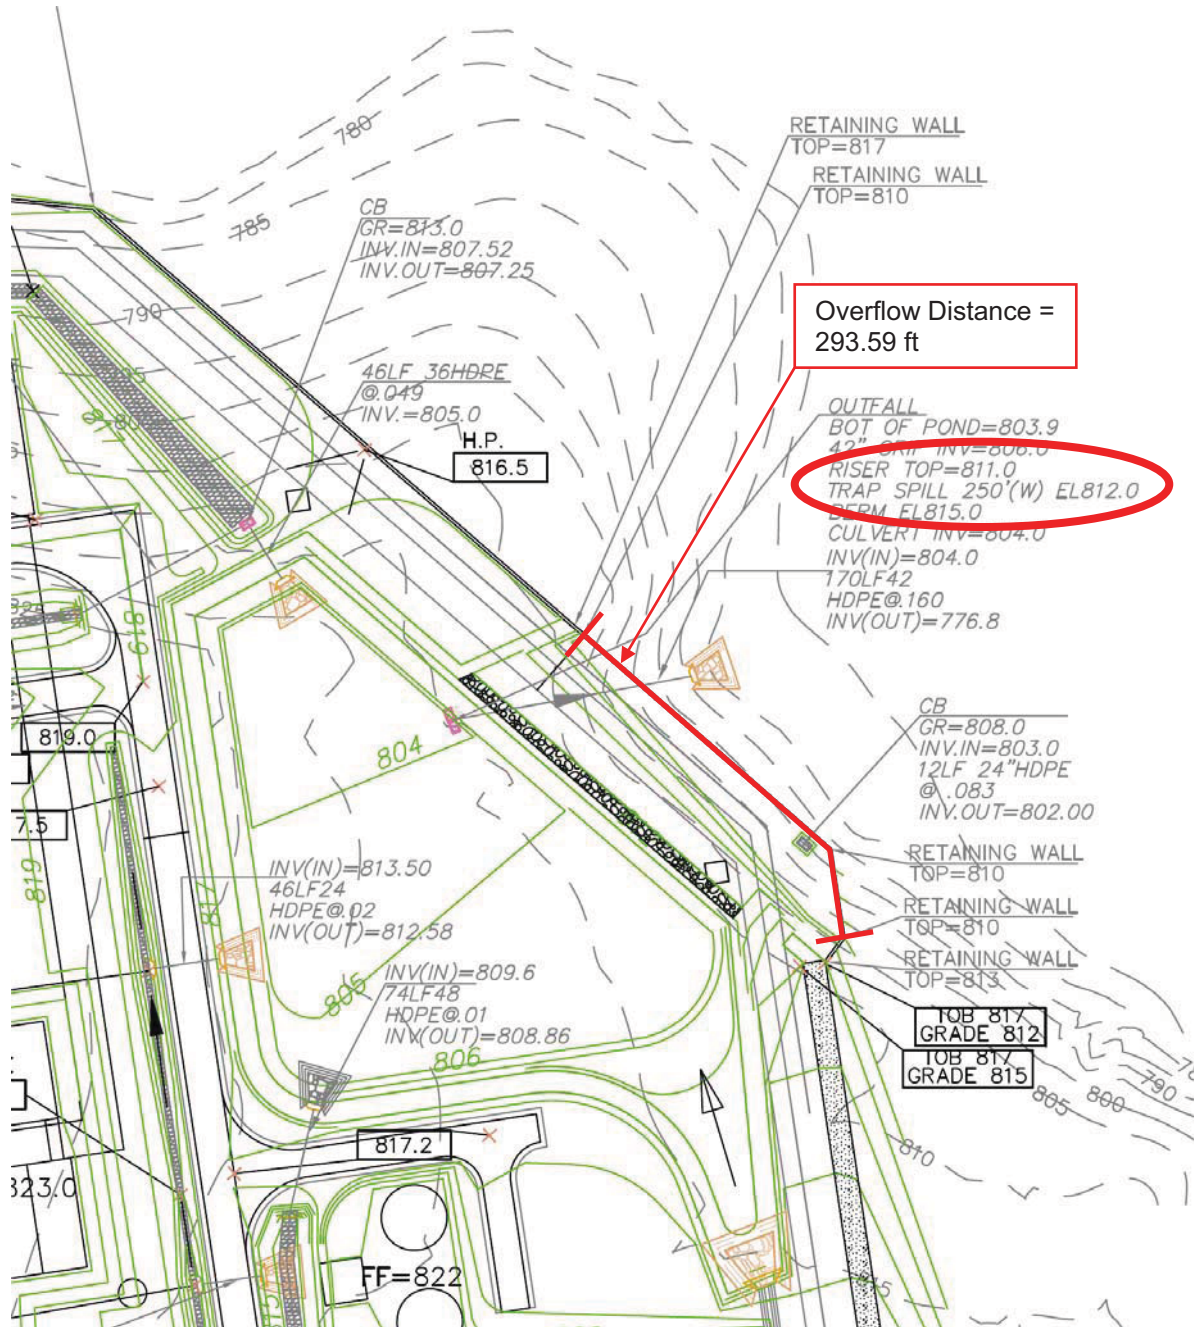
Drainage Pond B (Source: URS 2011b)
